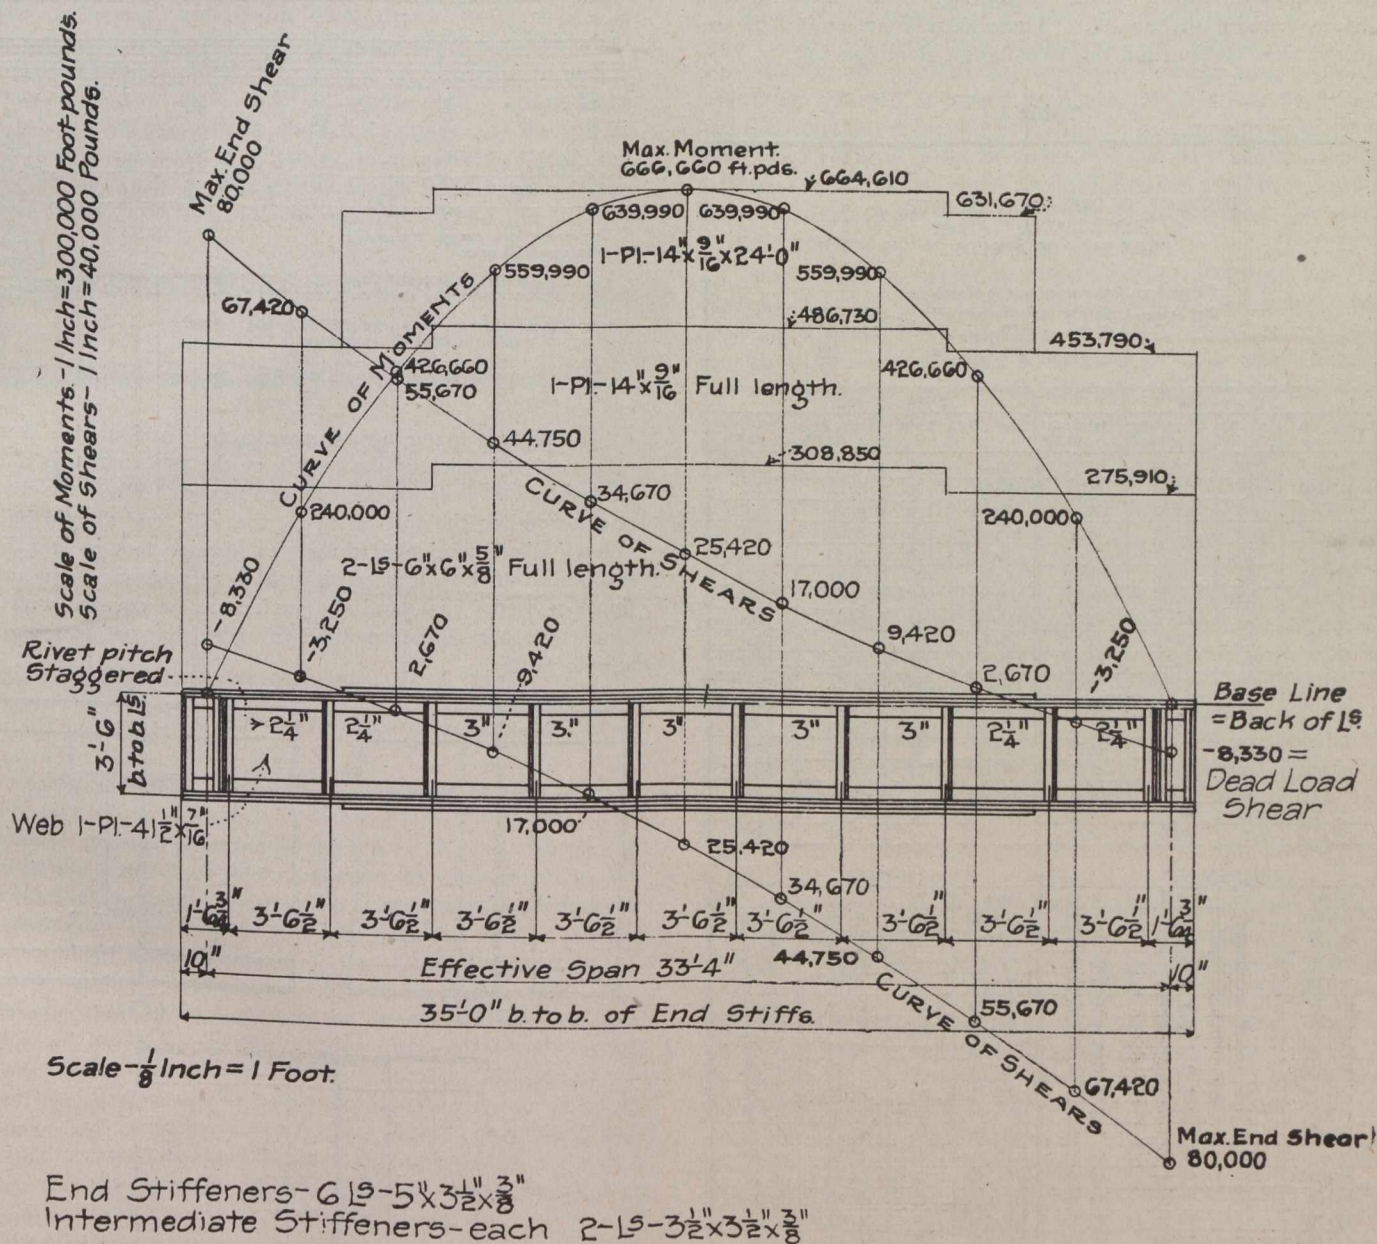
Stress and Section Diagram for Deck Plate Girder.
